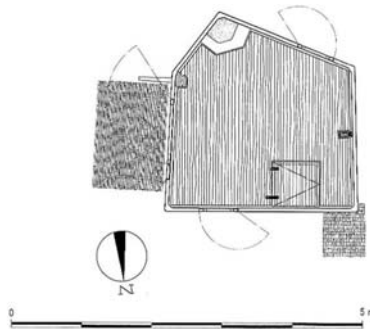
Asymmetrical plan form; Fig. 2.19 The hearth is positioned in one corner, with the chimney above. A section of the tree trunk covered in bark protrudes through the white plastered wall.
